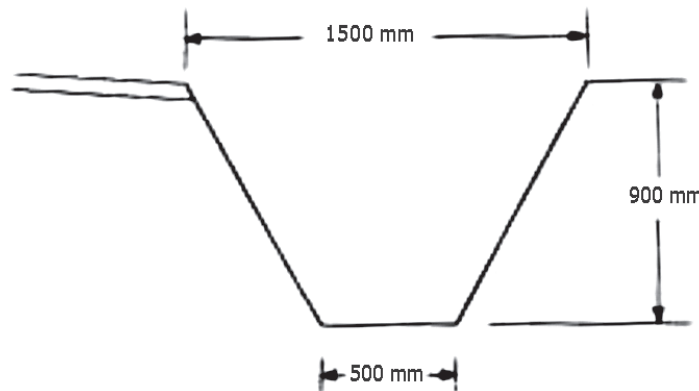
a) Typical Cross Section of Side Drain in soil
